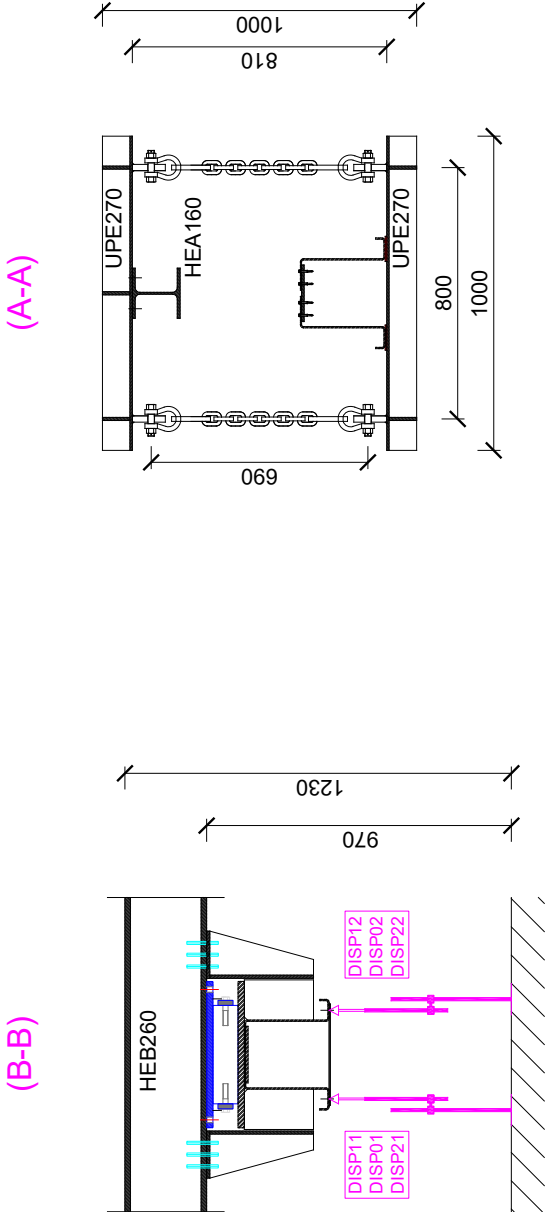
Layout of the steel beam specimen placed in test frame - (sectional views)
